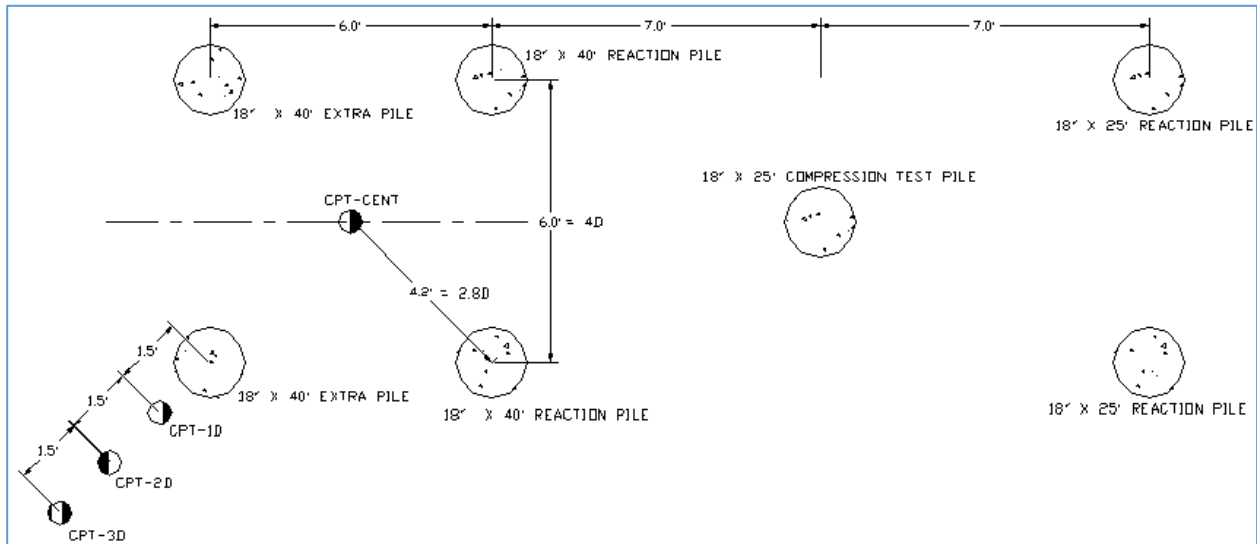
APGD Test Pile Layout with Additional CGEs installed for Densification Testing
